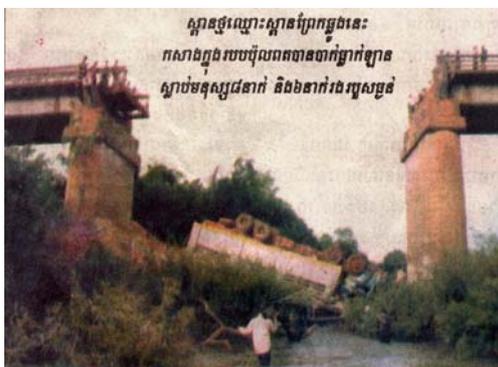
a heavy truck caused the collapse of a bridge on National Road 7 on May 14, 2004
